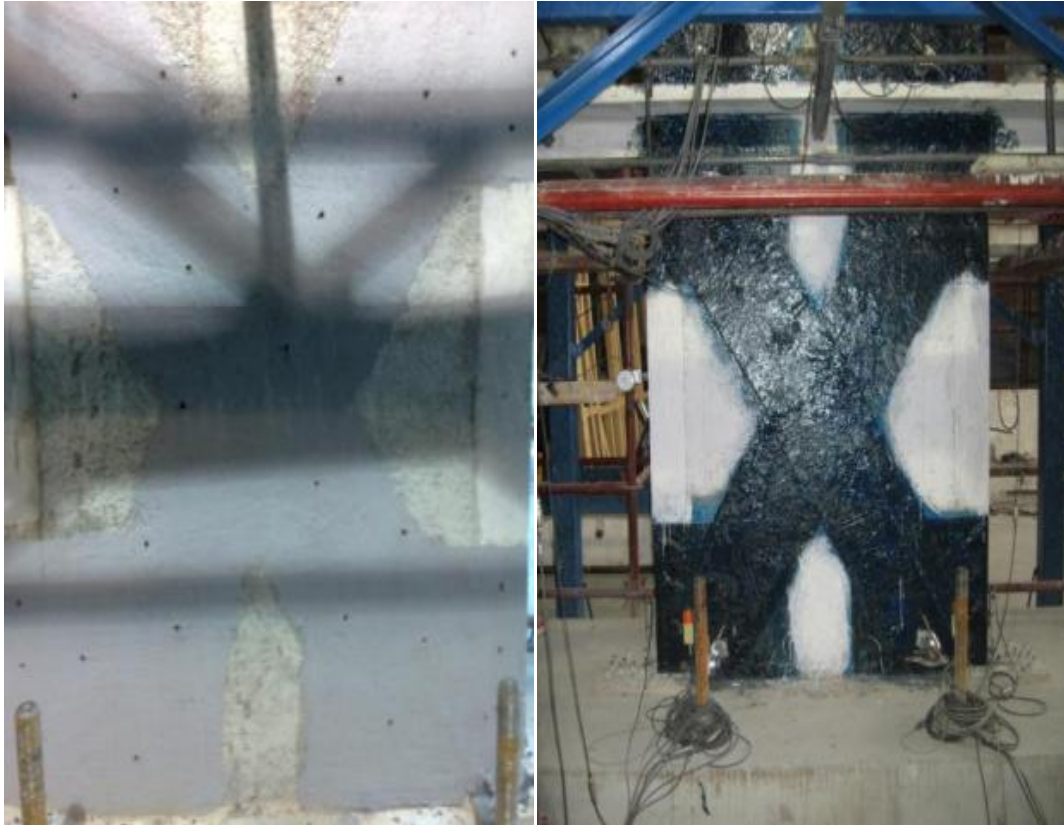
General view of the infill wall before and after placing FRP sheets.
